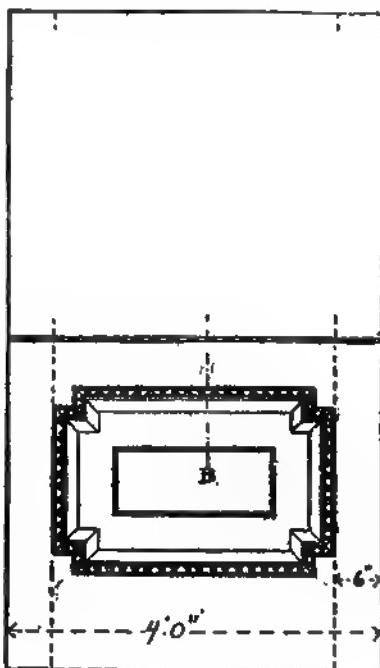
Outside "Dutch" Door. (See Fig. 383.)
